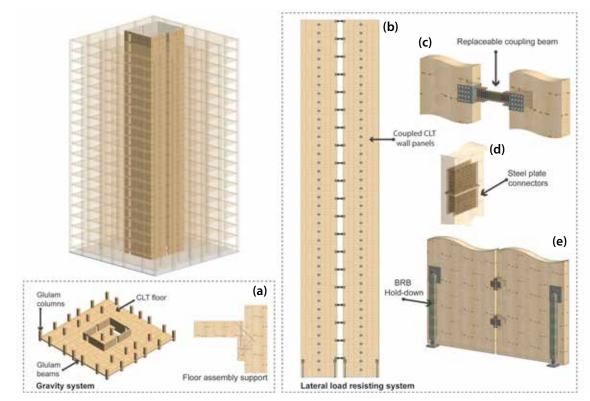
Tall timber coupled-wall building model, showing details of gravity system, energy dissipation coupling beams, and hold-downs.
